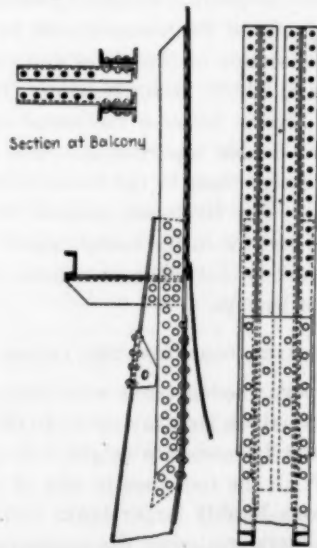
DETAIL OF ATTACHMENT OF TANK SHELL TO TOWER POST AND CIRCULAR GIRDER CONSTRUCTION
